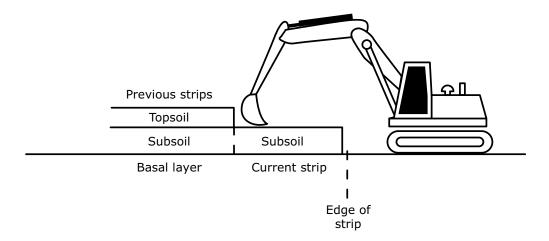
Soil replacement with excavators - dump trucks: Subsoil layer.
